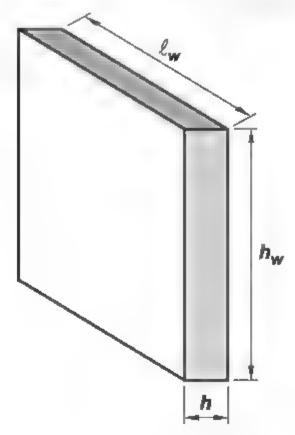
2 3b—Defining shear wall height, length, and thickness
